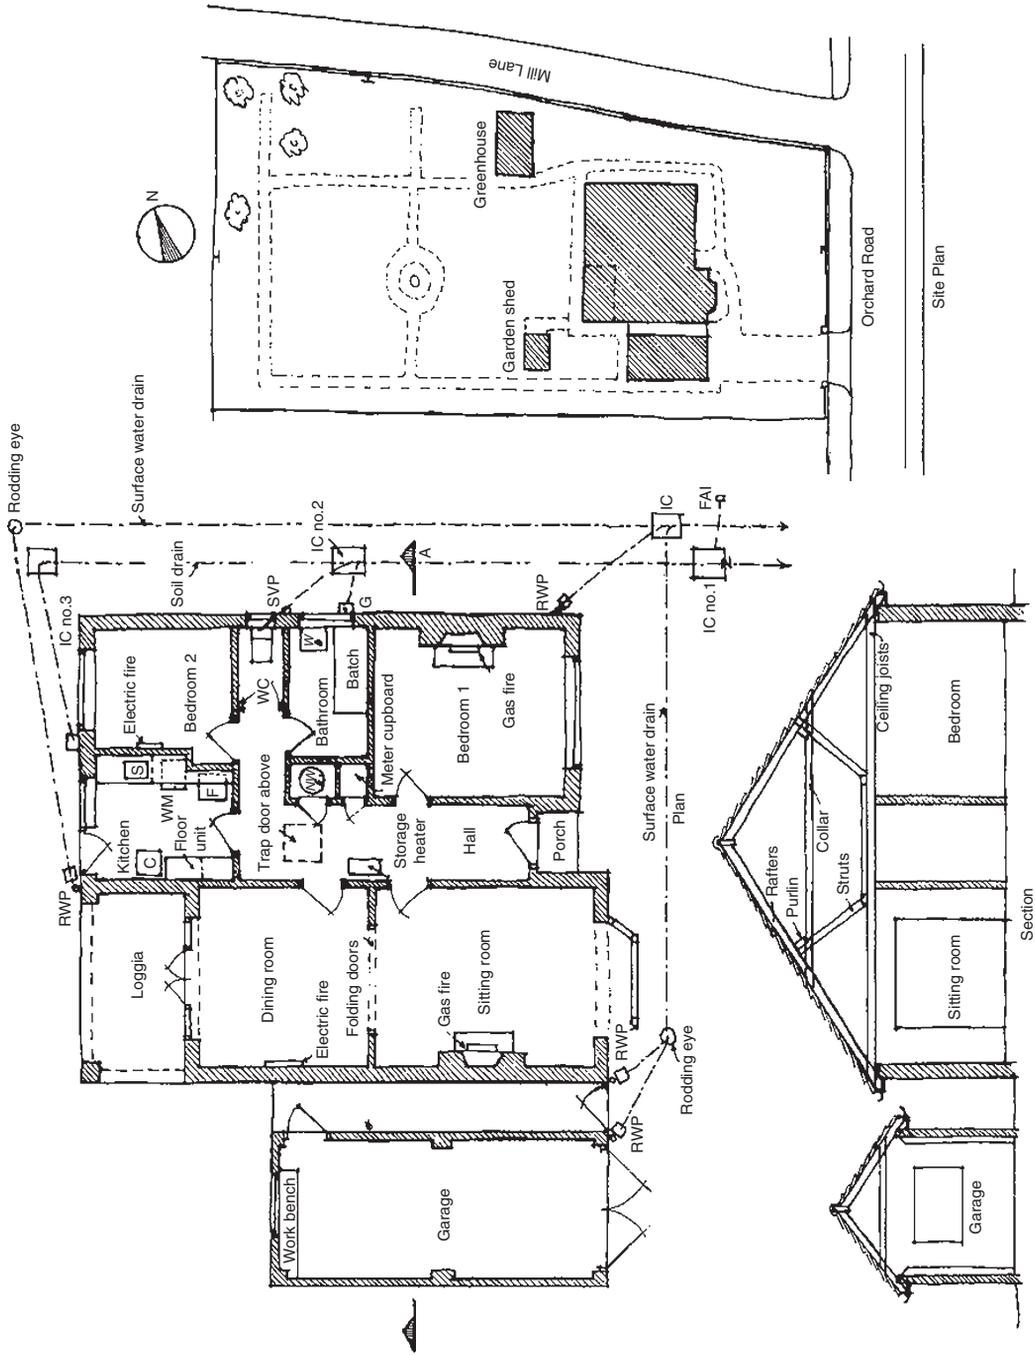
Figure AVII Plan of detached bungalow referred to in the report (Appendix VII)
